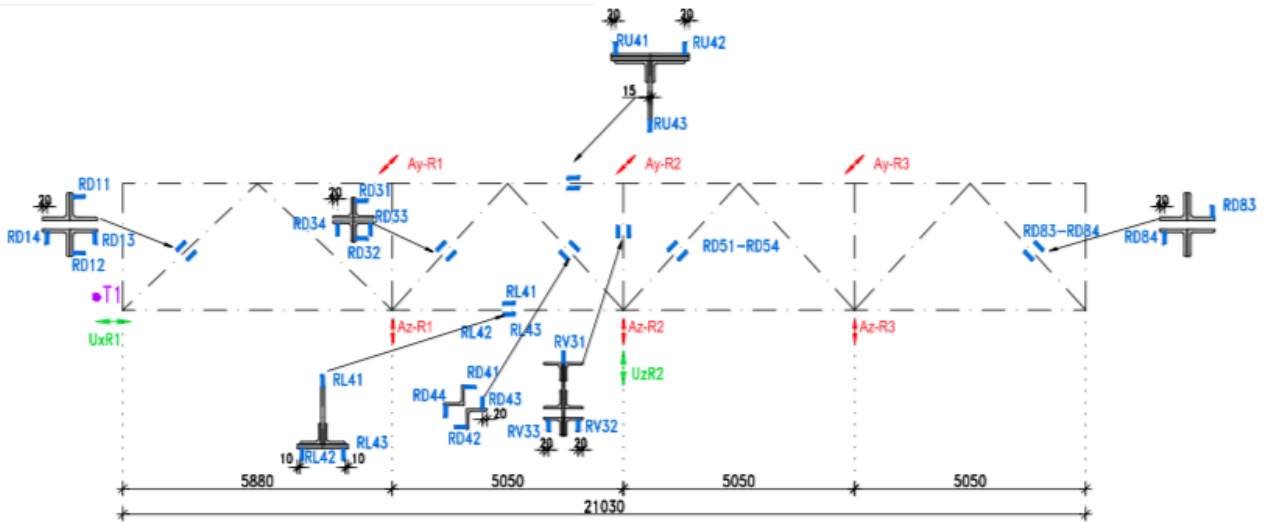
Monitoring Plan: South Elevation or Right Girder (Not to Scale).
